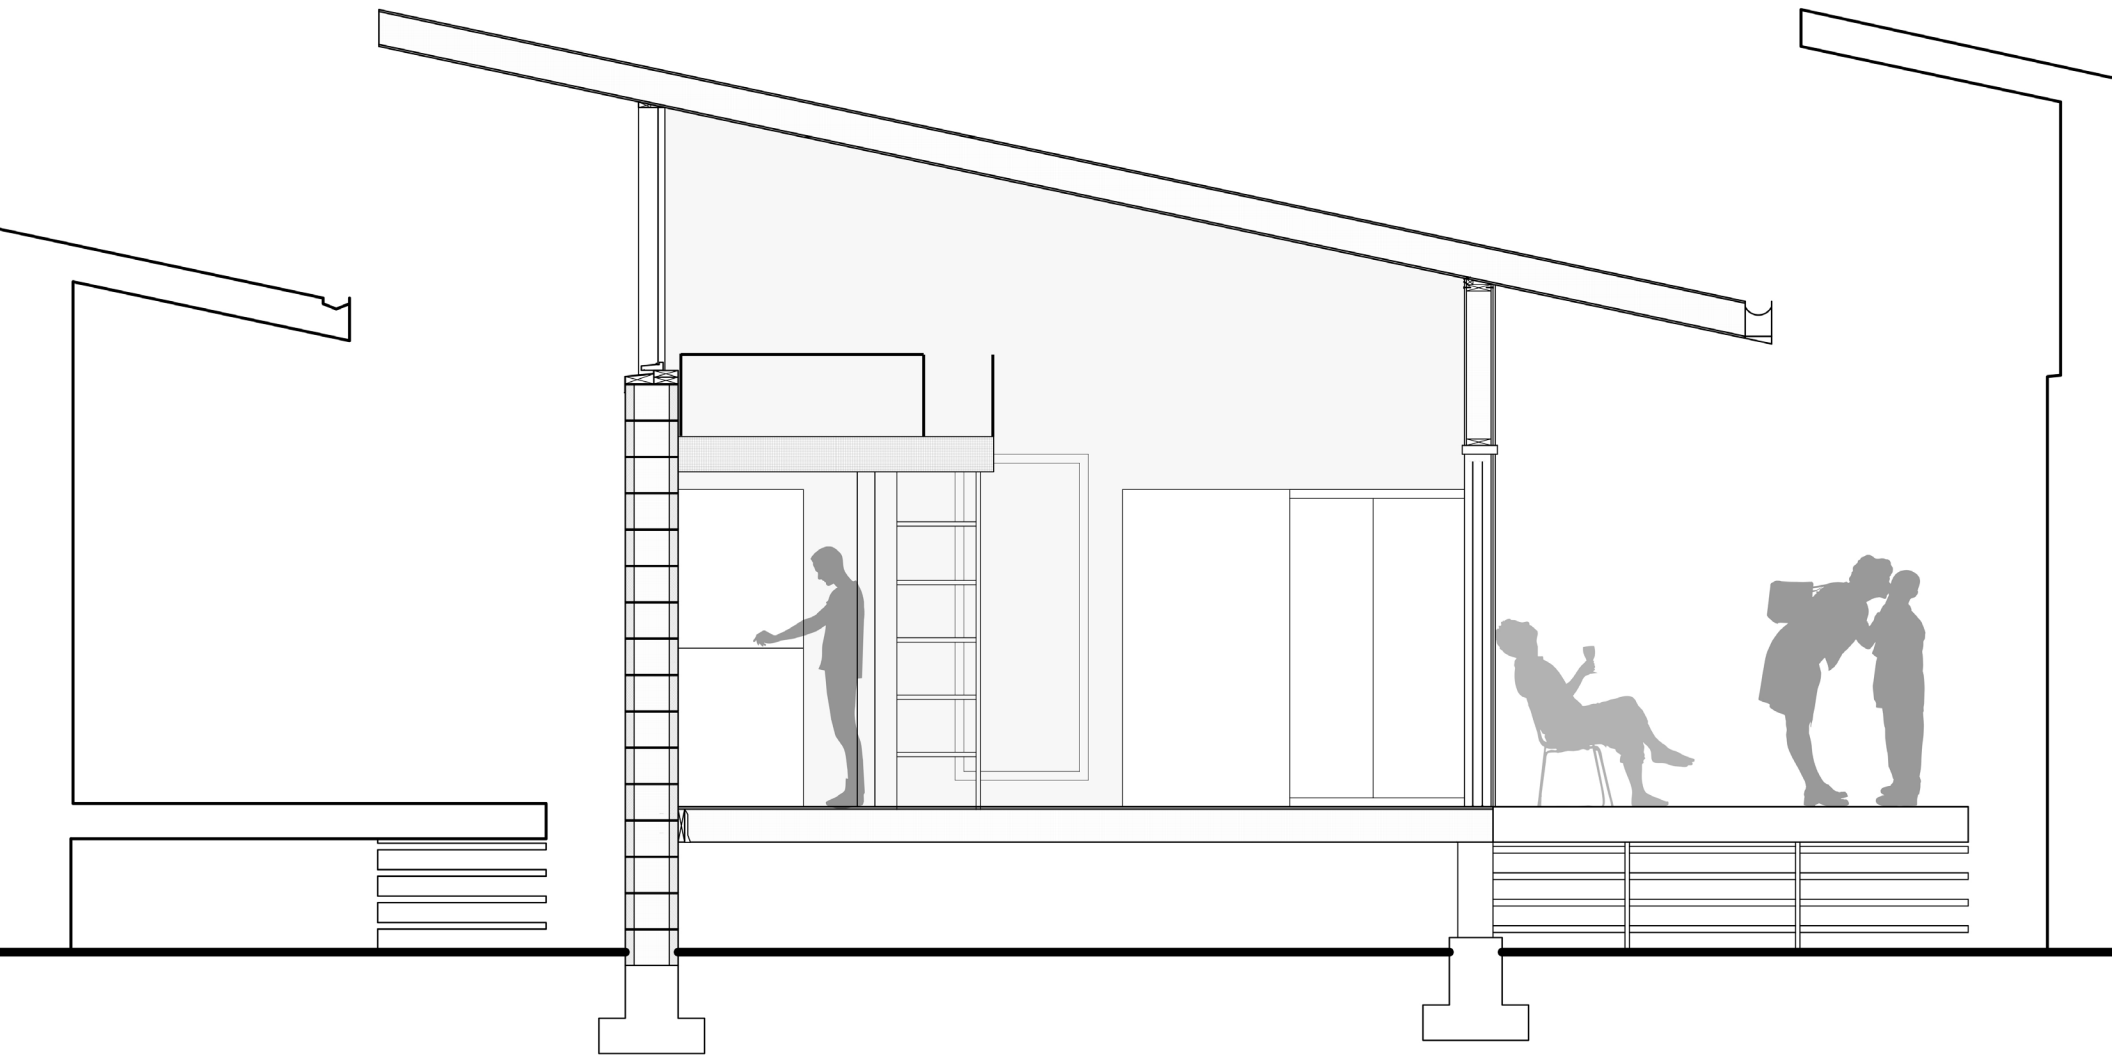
SECTION SHOWING EXPRESSED CMU WALL, AND BLEND OF SPACE FROM INTERIOR TO EXTERIOR
